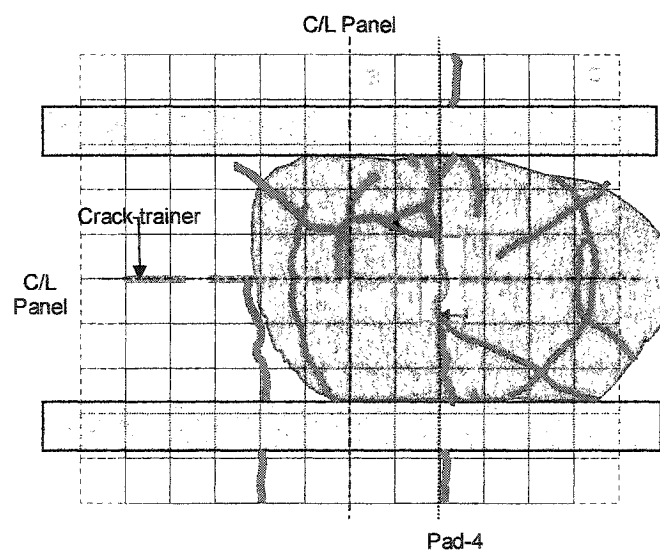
Panel-B Crack Pattern on Soffit after Static Failure
